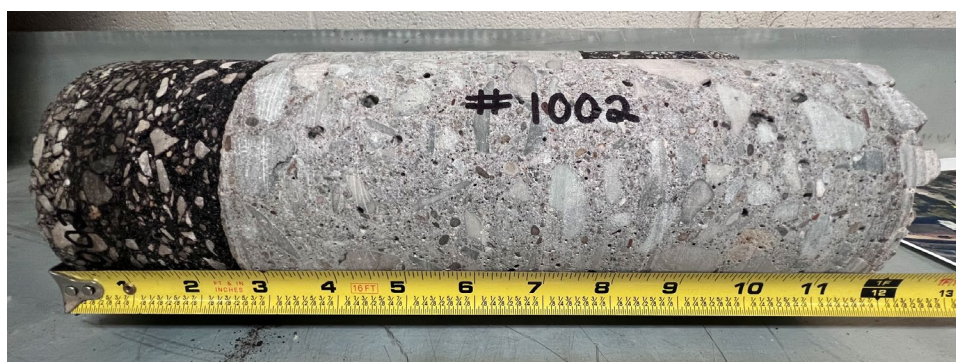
Core taken from WB driving lane adjacent retaining wall and steps for 1517 Algonquin Pkwy.
